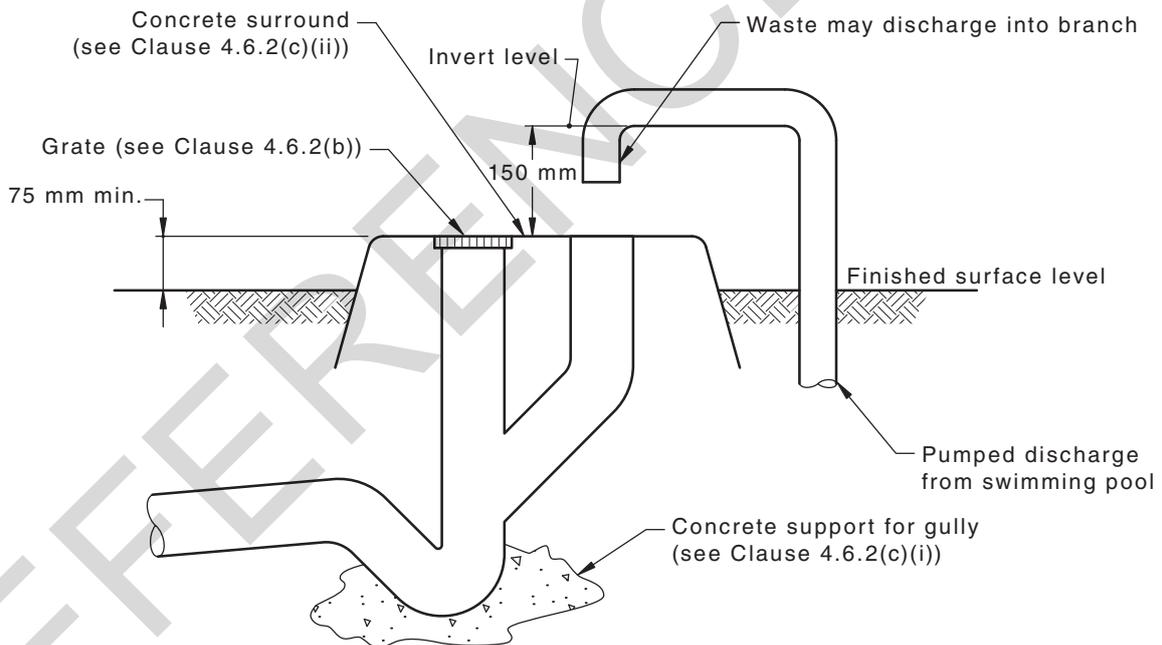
(B) ~~TYPICAL~~ CONNECTION OF PUMPED WASTE DISCHARGE FROM SWIMMING POOLS
